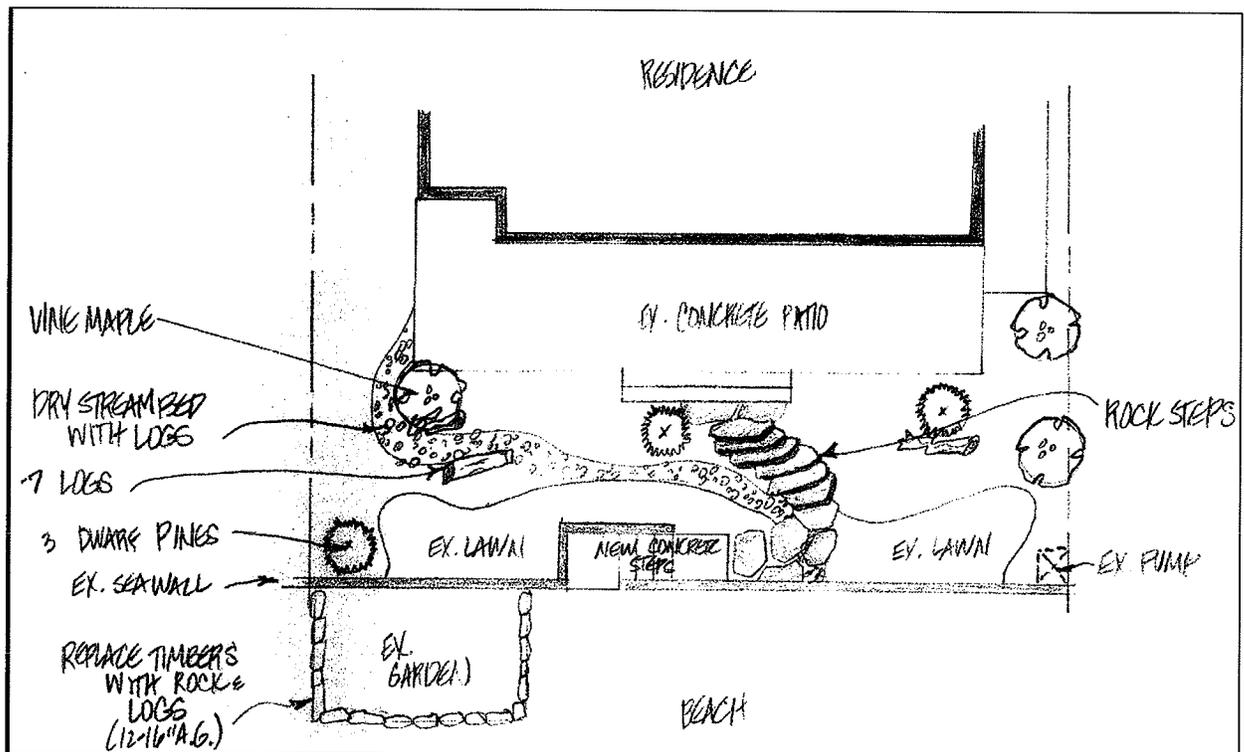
Proposal (detail on shrubs and ground covers not shown)
